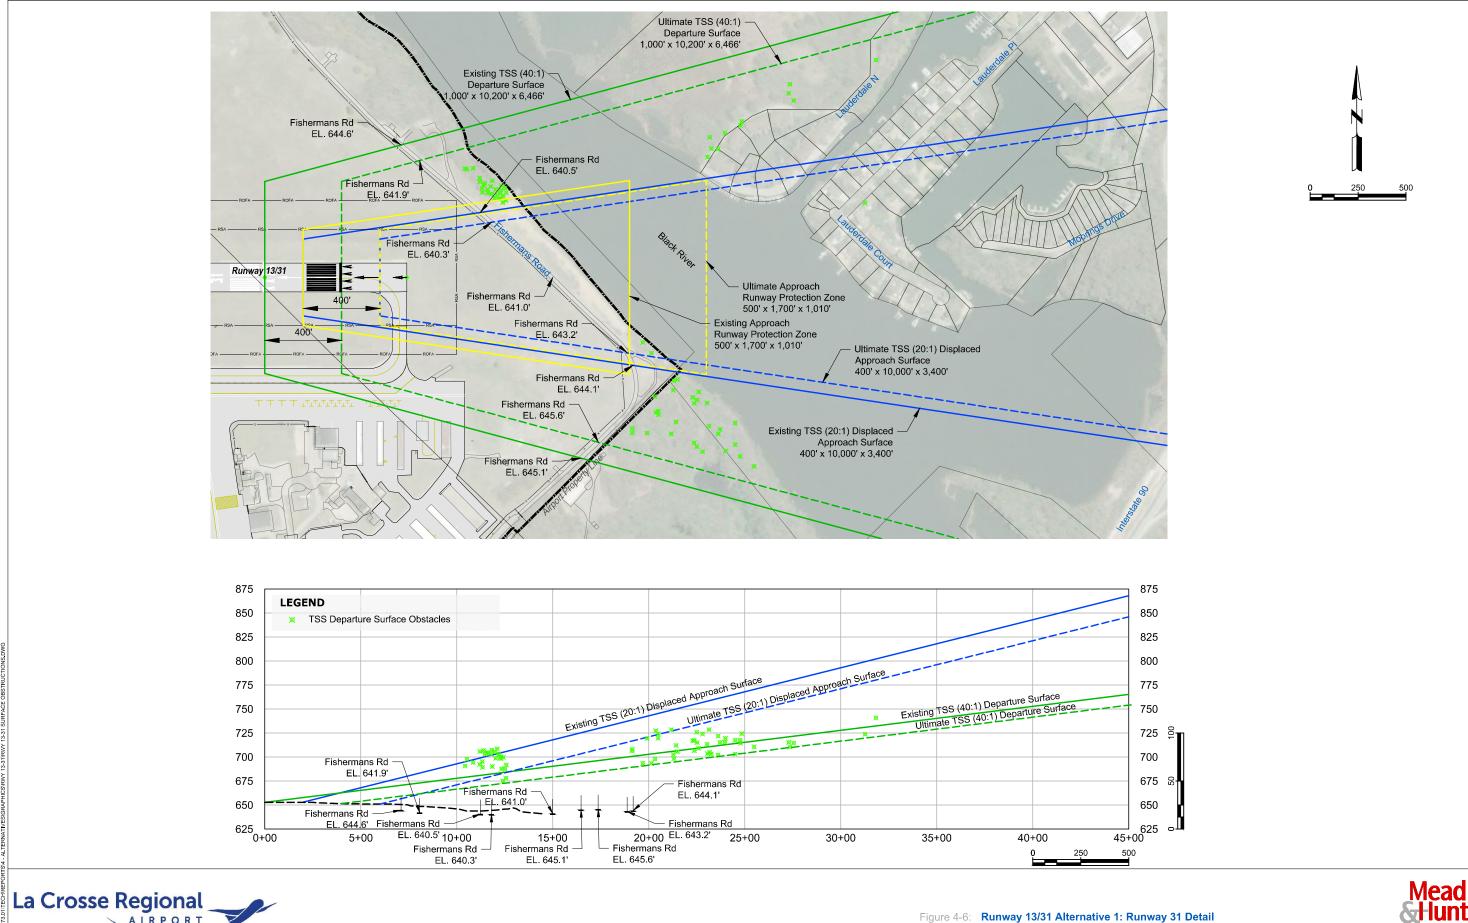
Runway 13/31 Alternative 1: Runway 31 Detail
